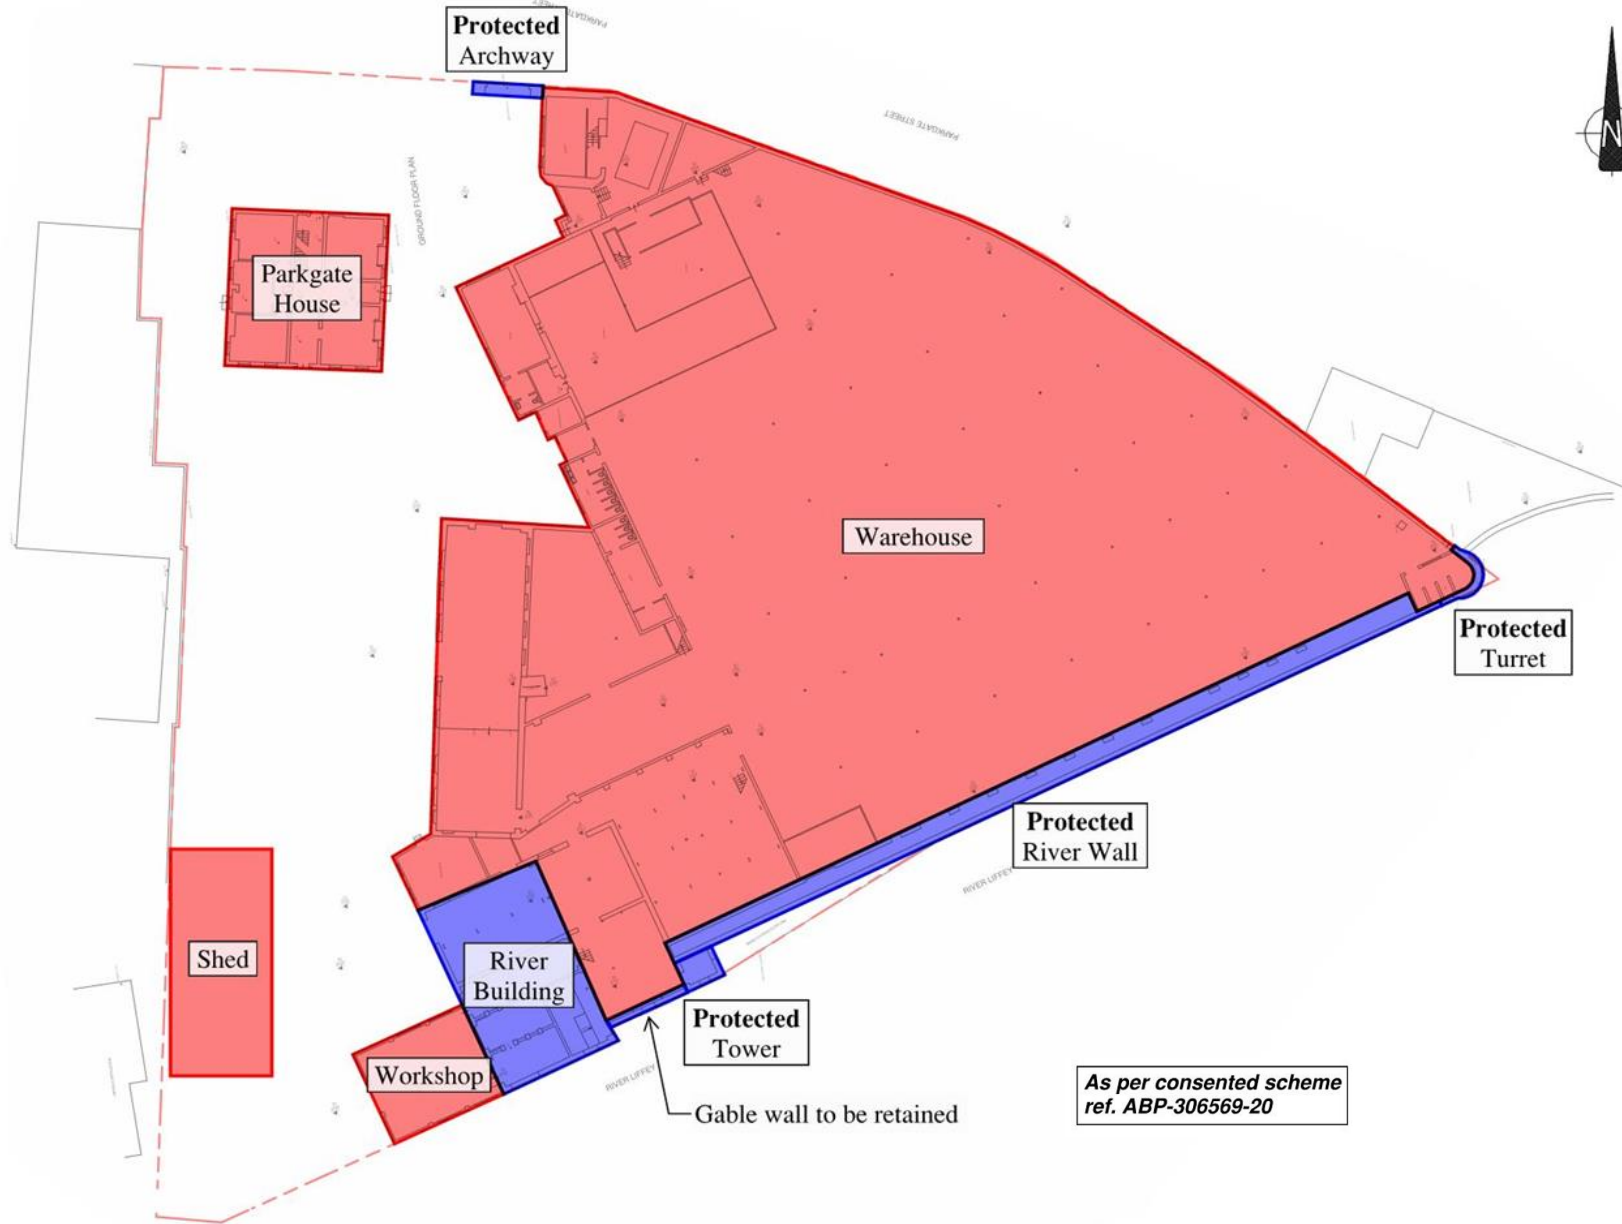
Layout of existing structures (red reflects demolition; blue reflects to be retained)
